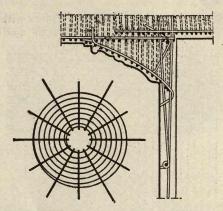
A.-Head Reinforcement and Plan of Basket.
